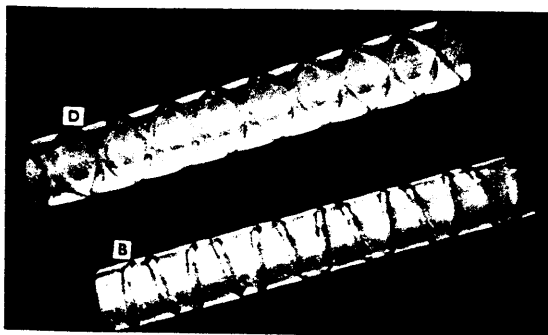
View of No. 6D and No. 6B Reinforcing Bars
